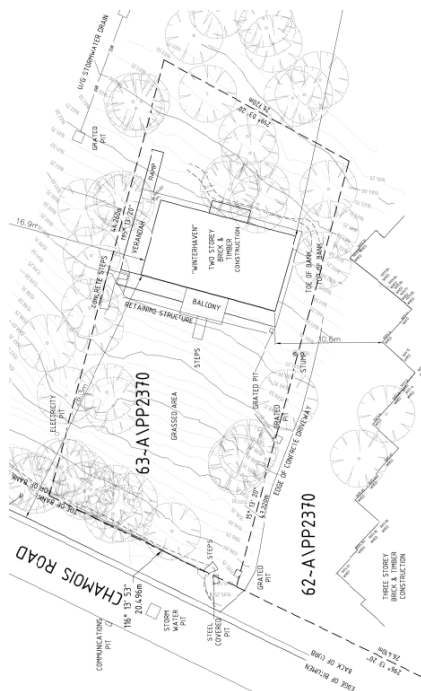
Survey Plan showing existing lodge, to be retained – (Source: Application)
